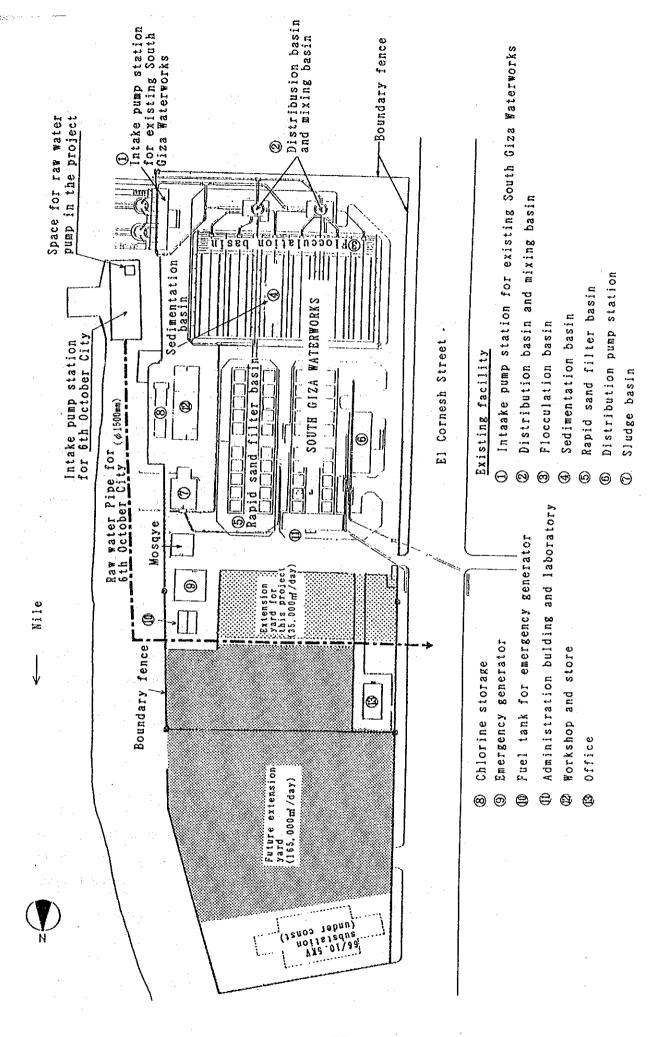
Existing South Giza Waterworks and Land for Expansion Plan
